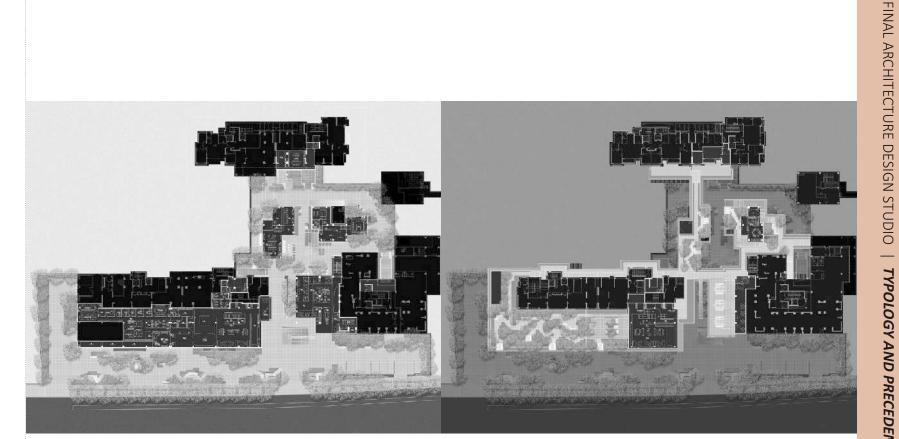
TROP: terrains + open space Plan. Source: ArchDaily
